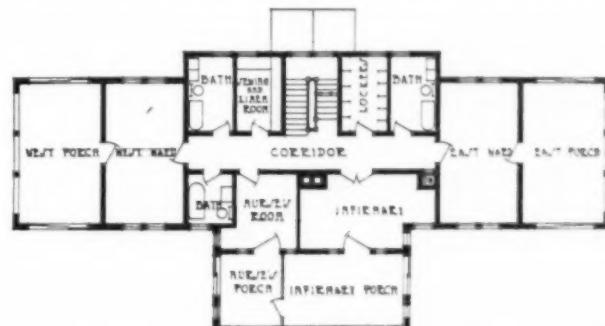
Nopeming Hospital for Tuberculosis. Children's pavilion. Second floor plan.
